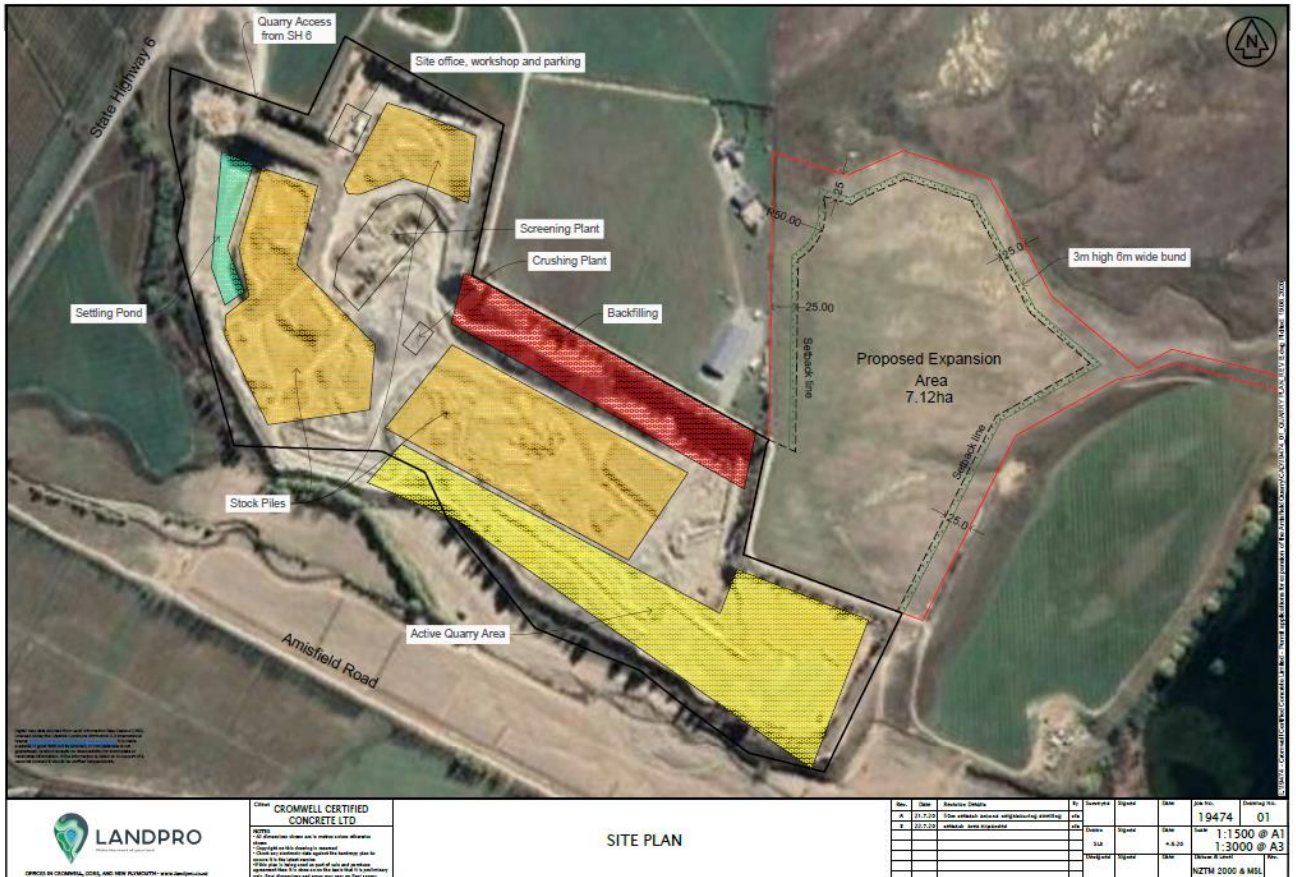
Site plan of the quarry showing the location of the washing and screening plant and the crushing plant (reproduced from Figure 2-1 of the Beca Report)
